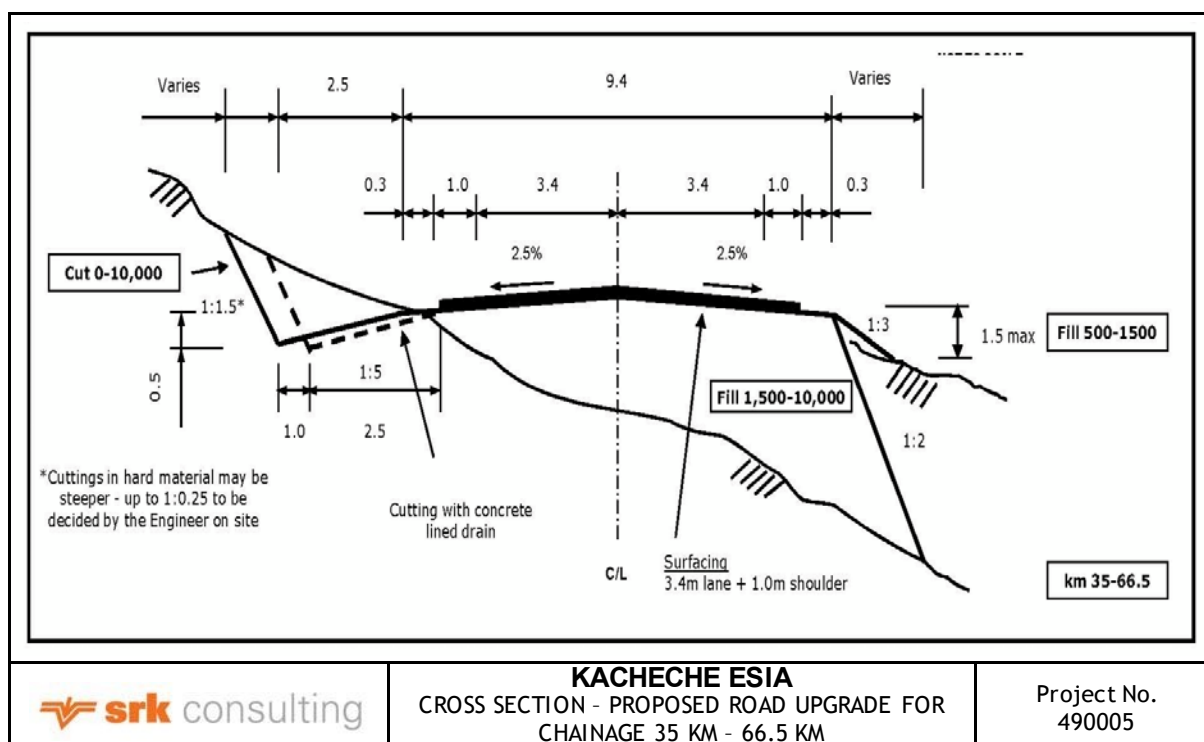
Typical cross section of the proposed road upgrade for chainage 35 km – 66.5 km
